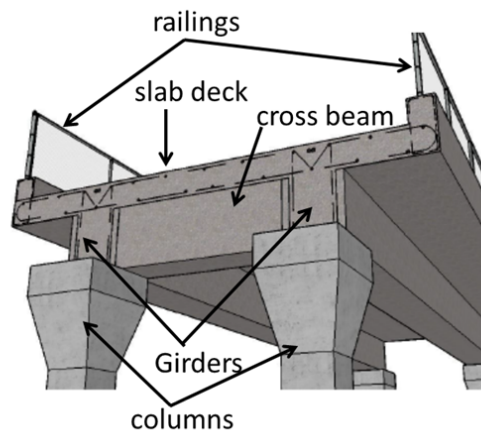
shows the structural configuration of the bridge. The reinforced concrete (RC) bridge deck is supported by two longitudinal RC girders. At each bridge support, a RC cross beam connecting the girders rests on the column supports. The cross beams provide additional deck stiffening and resistance to twisting. Steel railings are attached to either side of the built-in curbs. The bridge has a 0.6% slope in the lateral direction allowing water to drain into the lake via openings in the curb.
